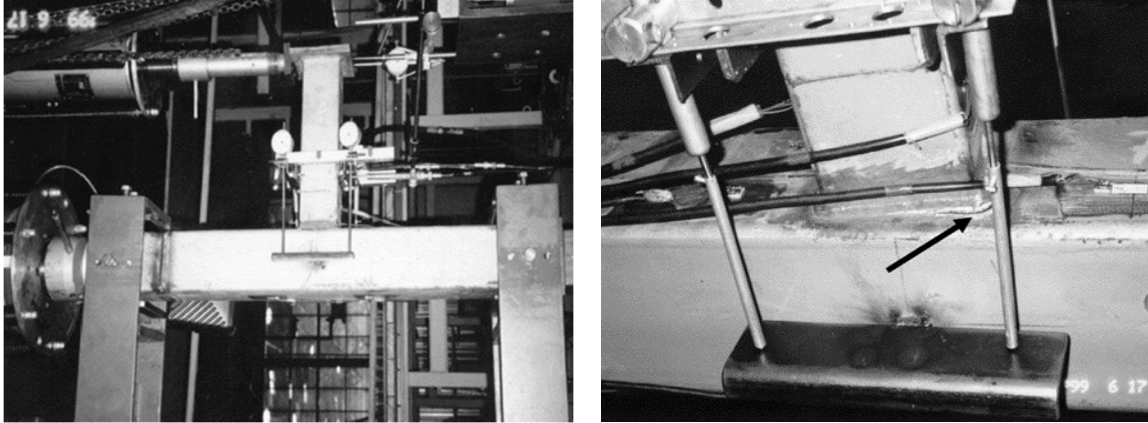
Specimen during test (left), joint failure (right) [53].
